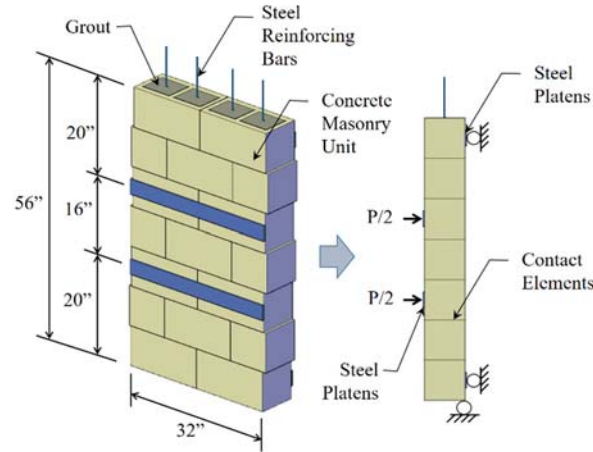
Reinforced dry-stack concrete masonry wall model.
